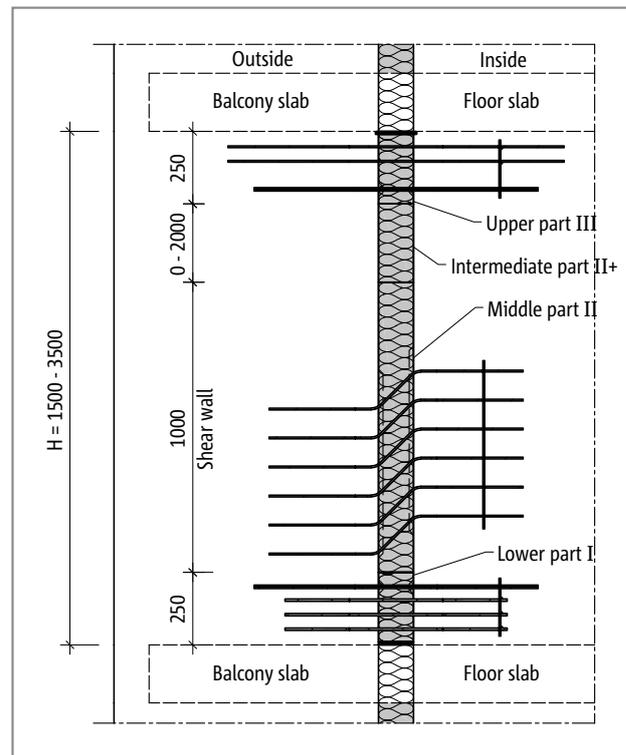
Schöck Isokorb® XT type W: Balcony construction with thermally insulated load-bearing shear walls
